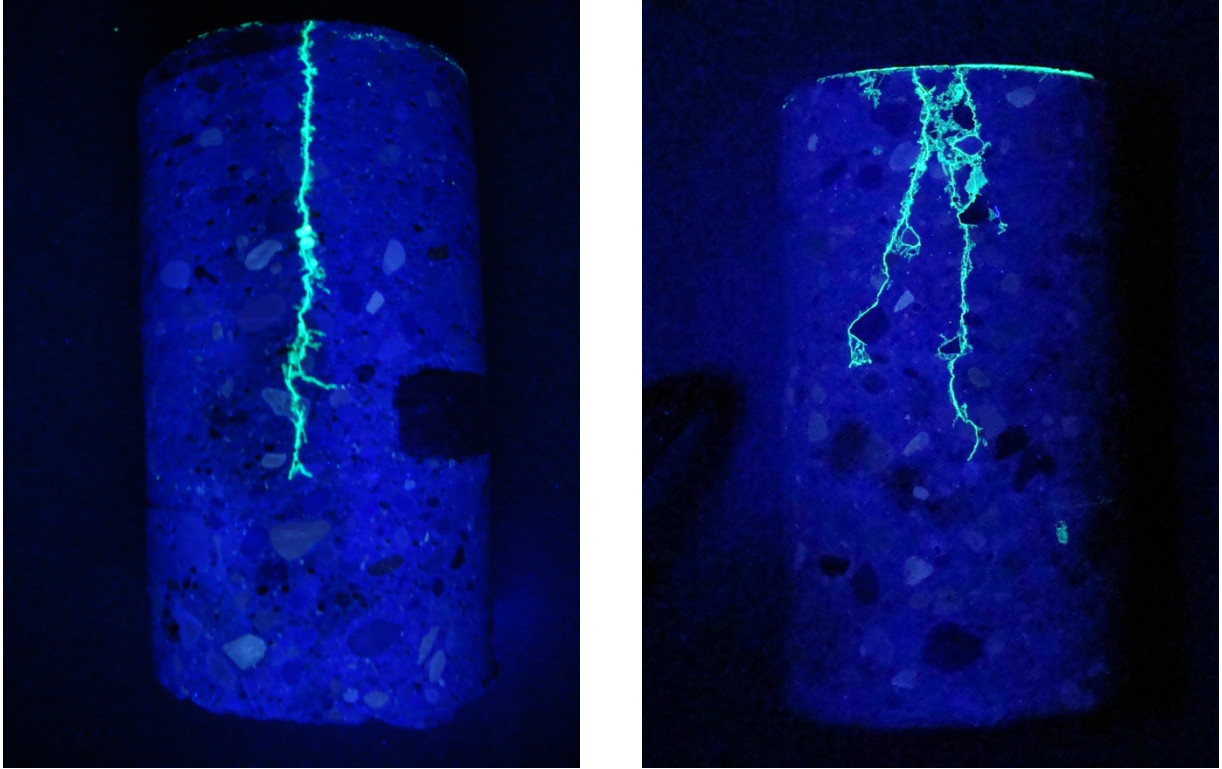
Core TS1 (left) west elevation; (right) east elevation
